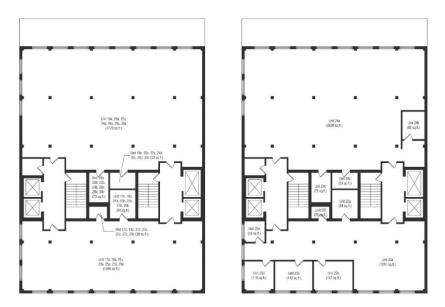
, 529 (left to right): Building 17, eleventh floor (1915); same floor (1984); 1'' = 32'. North is down.
